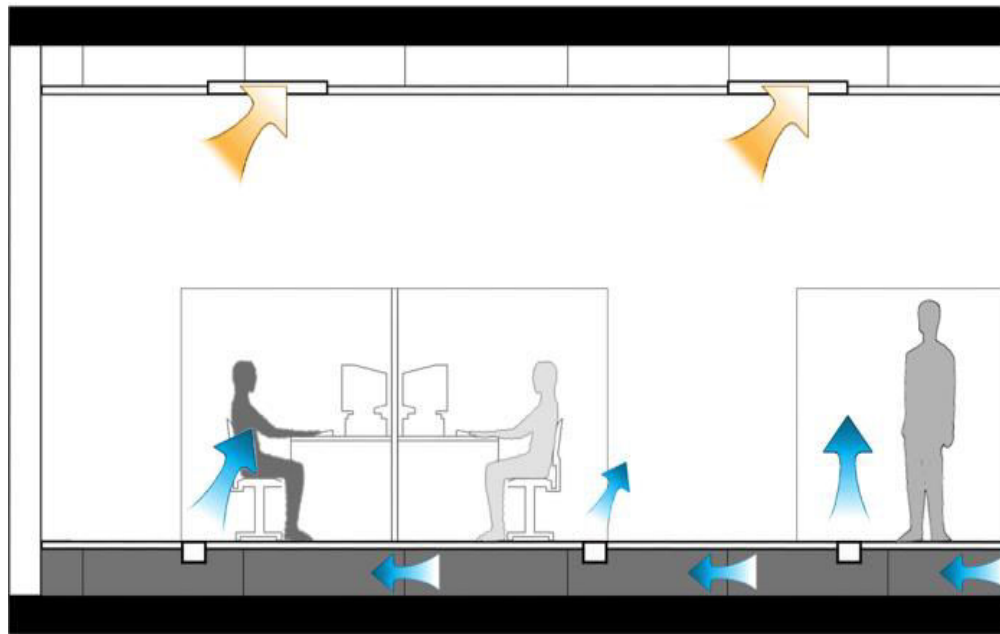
Underfloor Air Distribution systems introduce conditioned air through floor diffusers and exhausts air from the building via return grilles or vents in the ceiling
